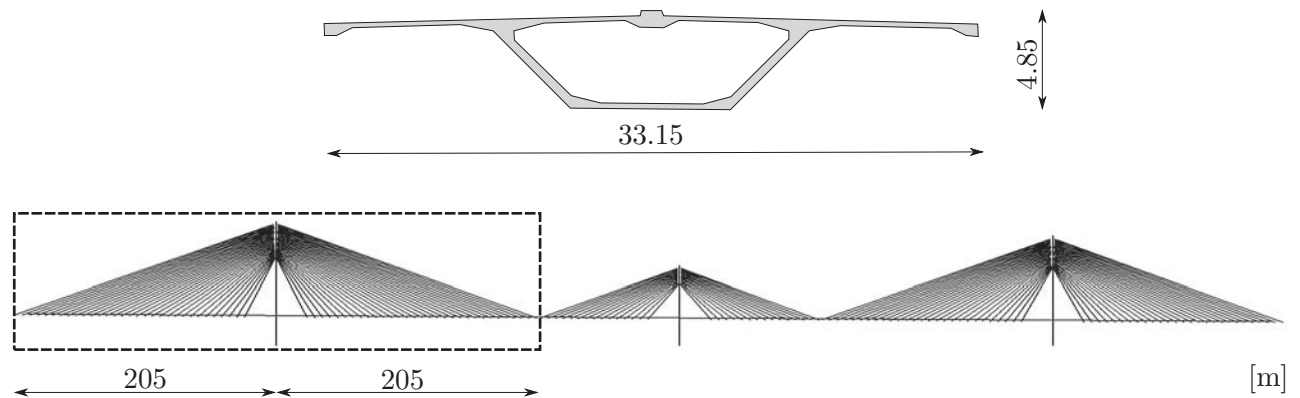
Mersey Gateway Bridge: deck cross-section (top) and structural system (bottom), including the considered south tower in the erection stage.
